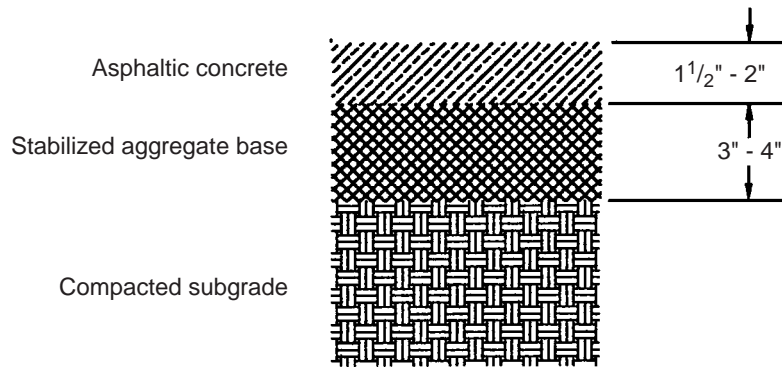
Asphalt concrete bike route surface detail (aggregate base).
